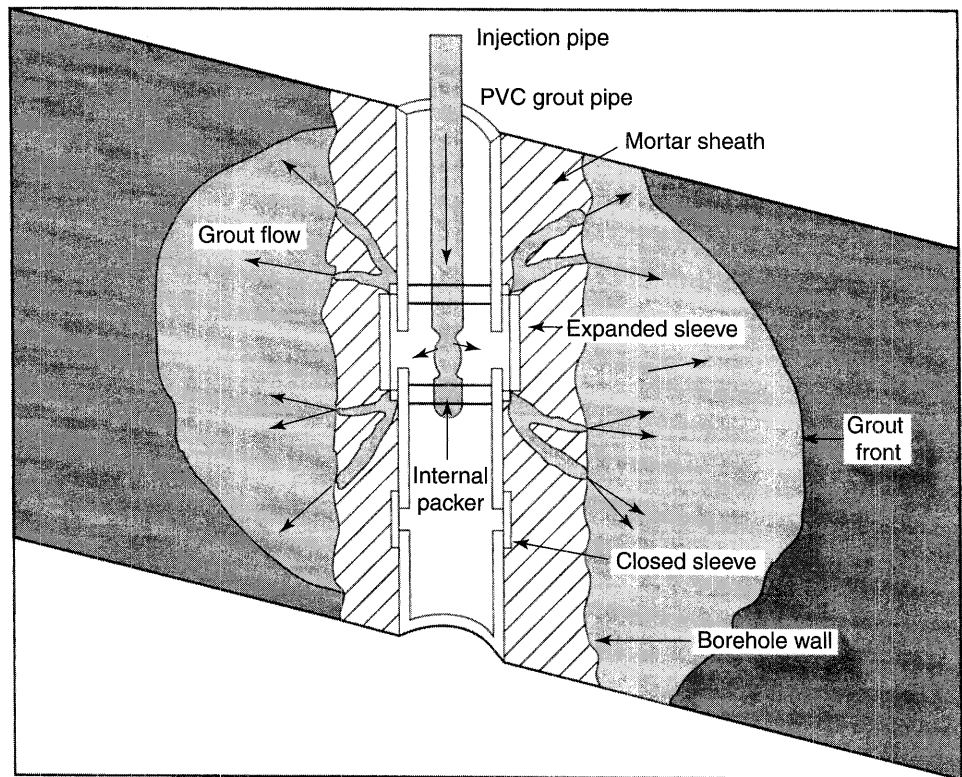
Grouting utilizing a sleeve port pipe. (Courtesy of Hayward Baker, Inc., A Keller Company)
